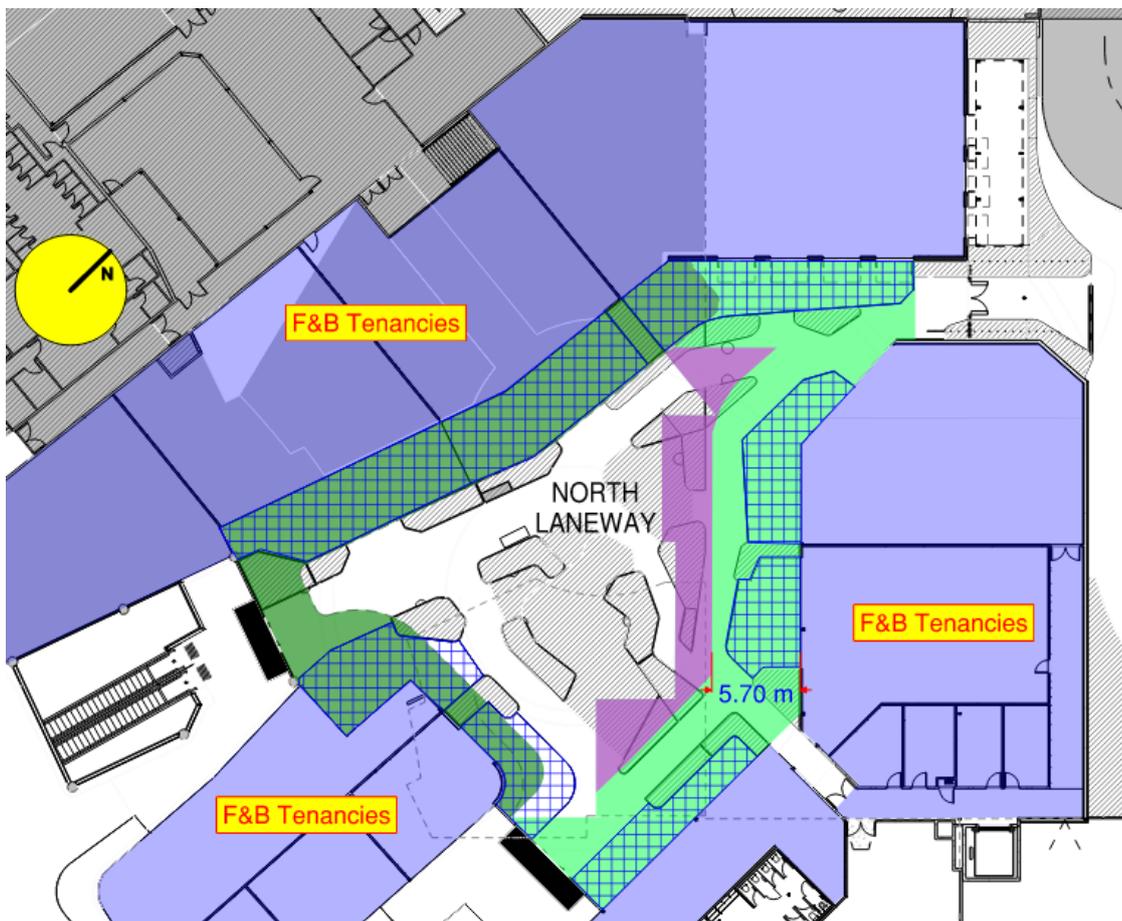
North Laneway layout and extent of sprinkler protection to canopies with extended coverage
